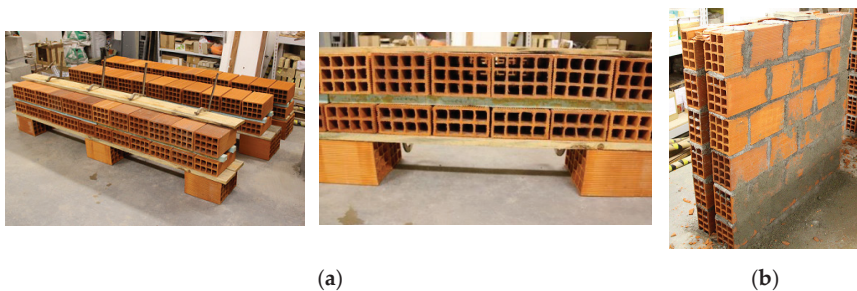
Test specimens and wallettes: (a) preparation of the isolated specimens; (b) masonry wallettes, adapted fom [30].
